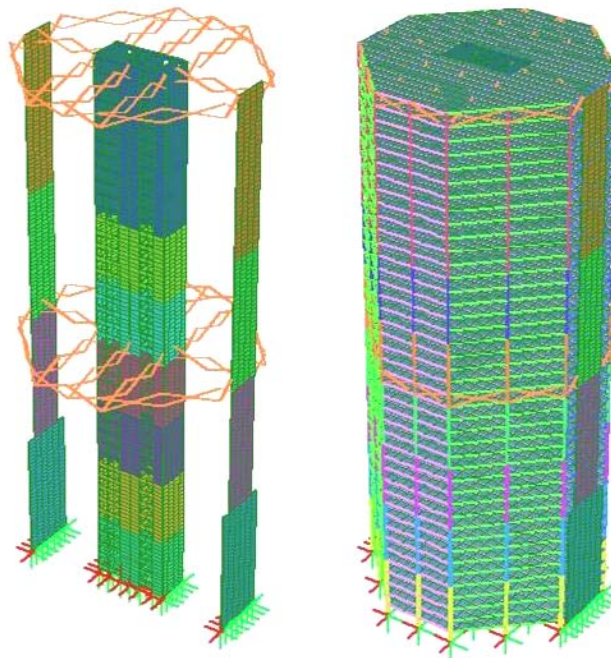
Octagonal Model Elevation (Shear Wall and Full Model)
